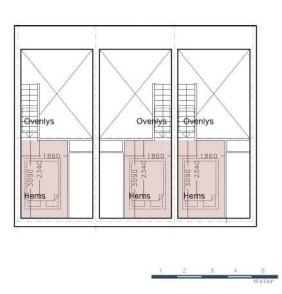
The smallest type of apartment (31 m²) in Tunet: one room with a loft. Source: Vandkunsten, 2018.
